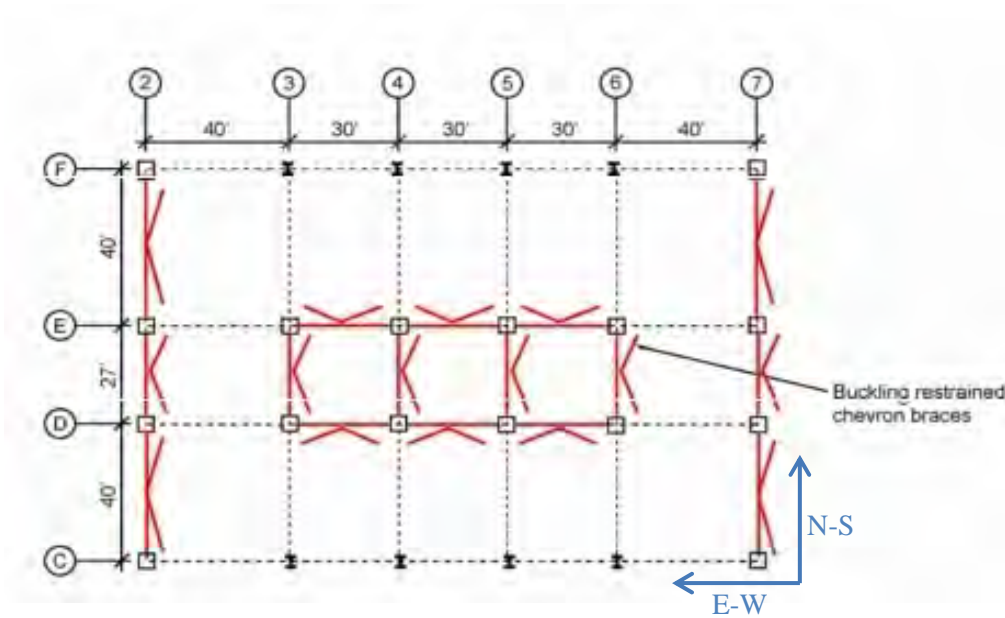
Plan of superstructure with three braced bays at grid lines 2 and 7. For Building 3A the plan corresponds to the first through tenth floors. For Building 3B the plan does not apply at all. For Building 3C the plan corresponds to the twentieth, thirtieth, and fortieth floors, which utilize outriggers. Box columns are shown as squares and the gravity columns are shown as W sections (I shaped). BRB bays are shown in red. Image courtesy of Dutta and Hamburger [2010].
